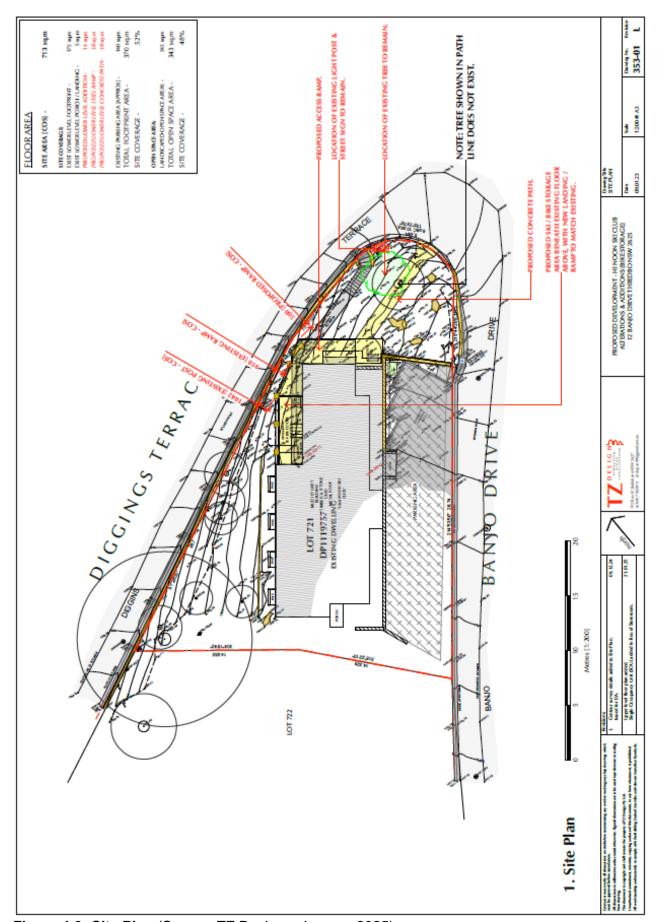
Site Plan (Source: TZ Designs, January 2025)
